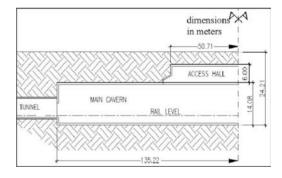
Longitudinal sketch of Corrientes Station, Line H.
